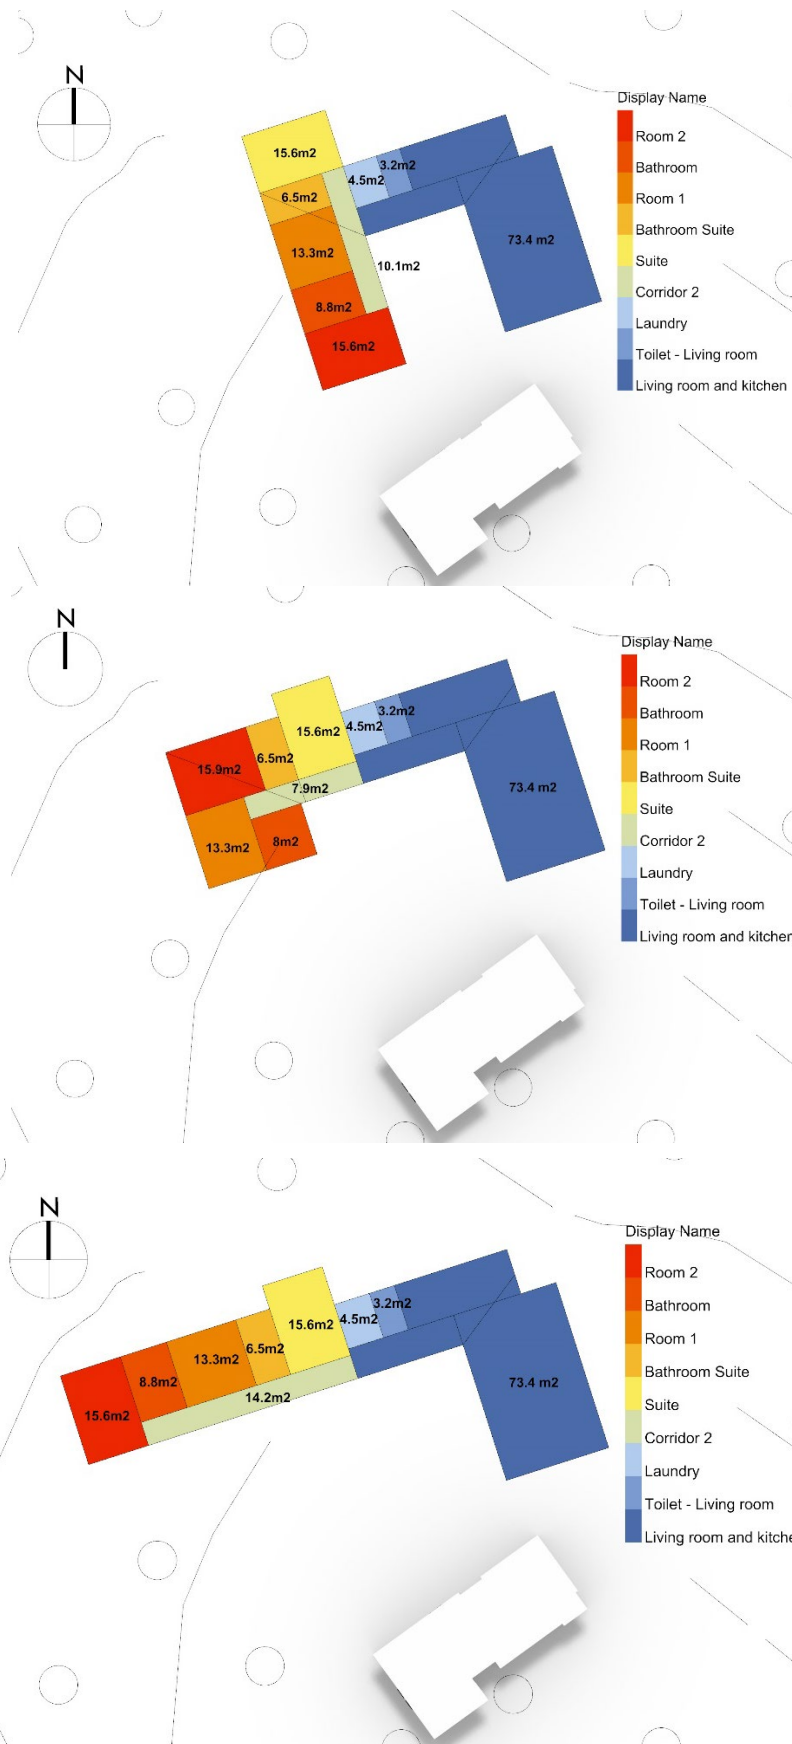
Schematic floor plan configurations of the three options (work of the author)
